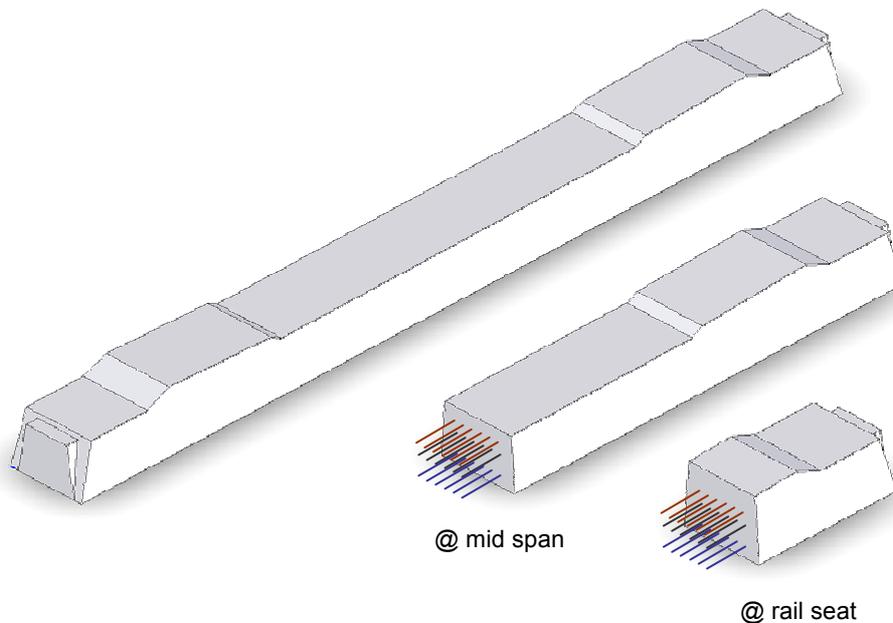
General profile and cross-sections of prestressed concrete sleepers
